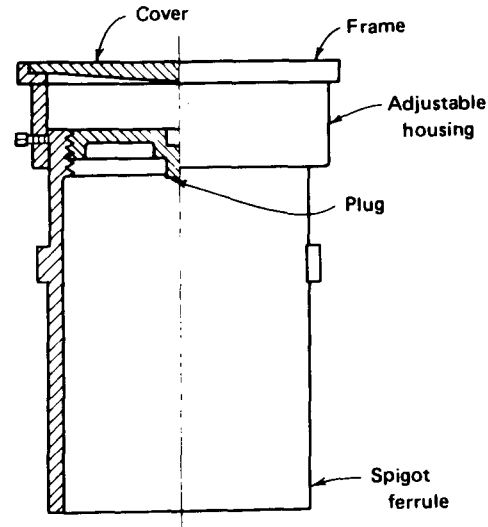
CLEANOUT WITH ADJUSTABLE HOUSING AND SPIGOT CONNECTION
